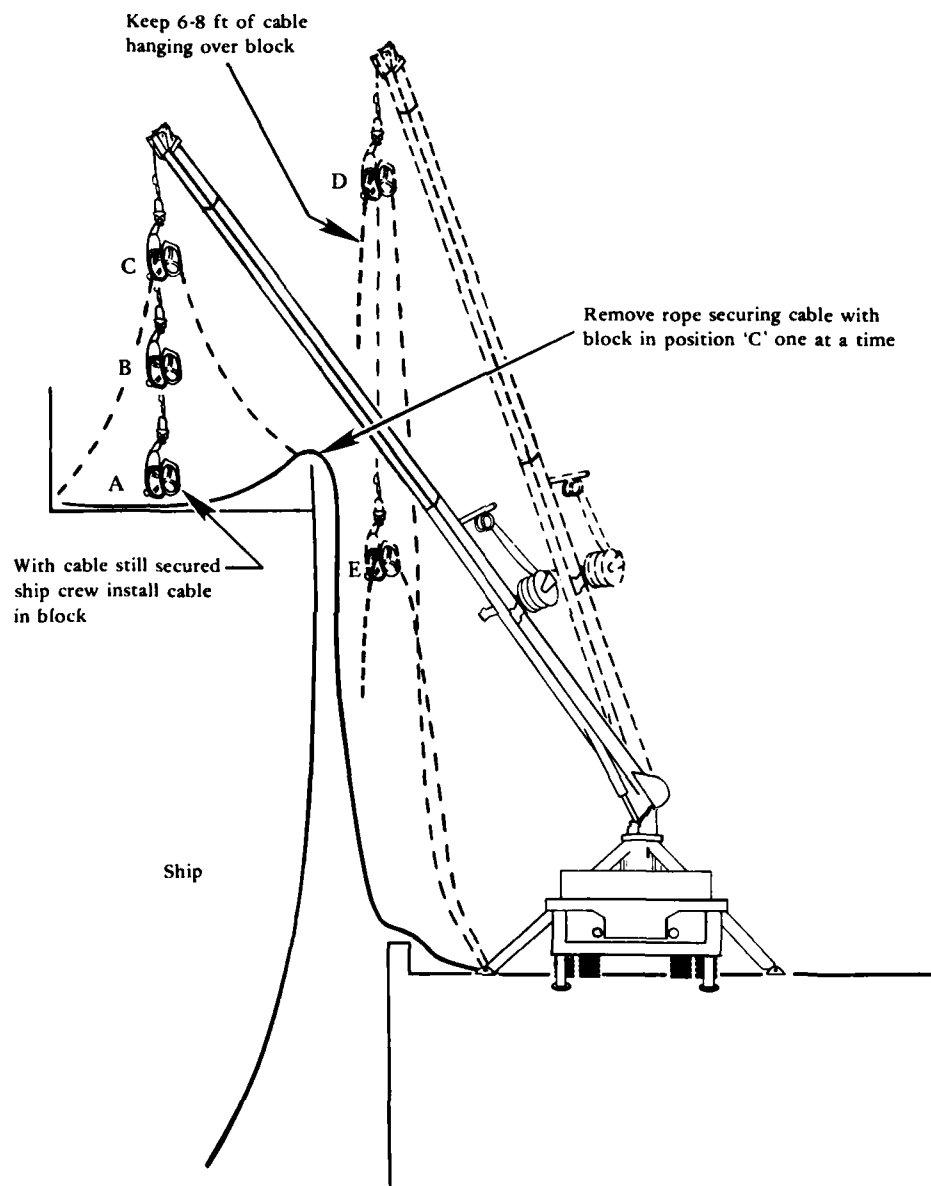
Removing cable from ship with cable installed in block aboard ship.
